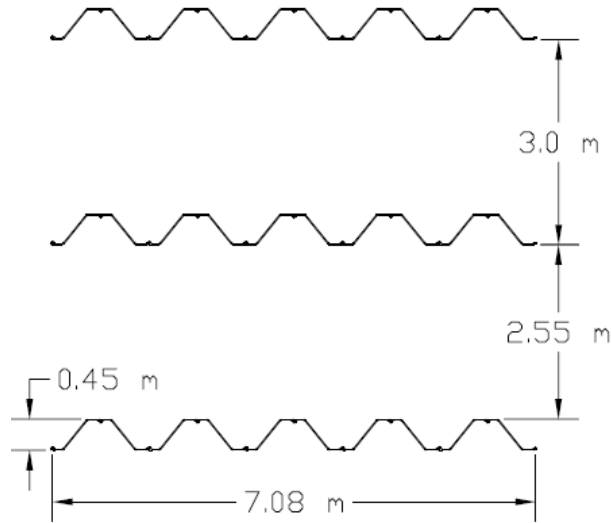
Layout of sheet piles for Hardy Ribs at CN Mile 191.4 Rivers Sub.
